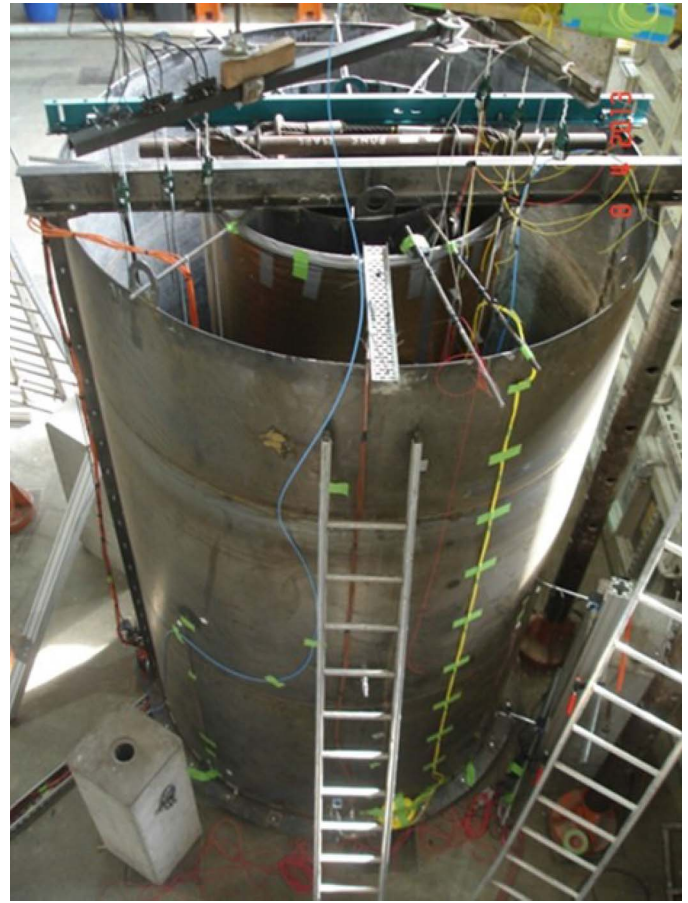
View of setup during installation showing assembled mould for the casting of the concrete buffer.
